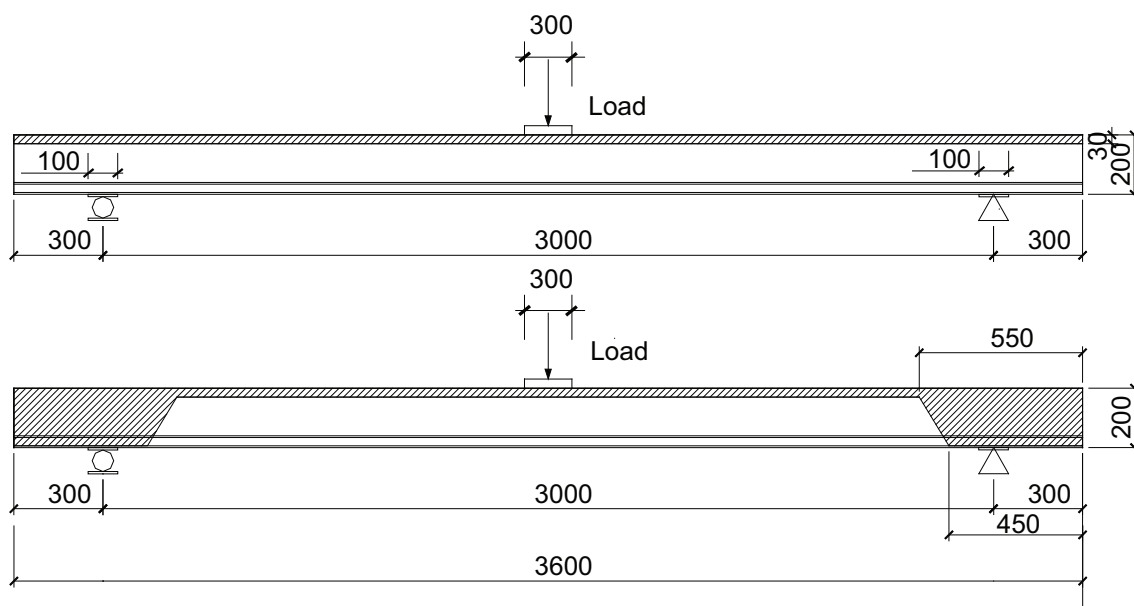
Dimensions of hybrid beam specimens: above without anchor blocks, below with anchor blocks.
